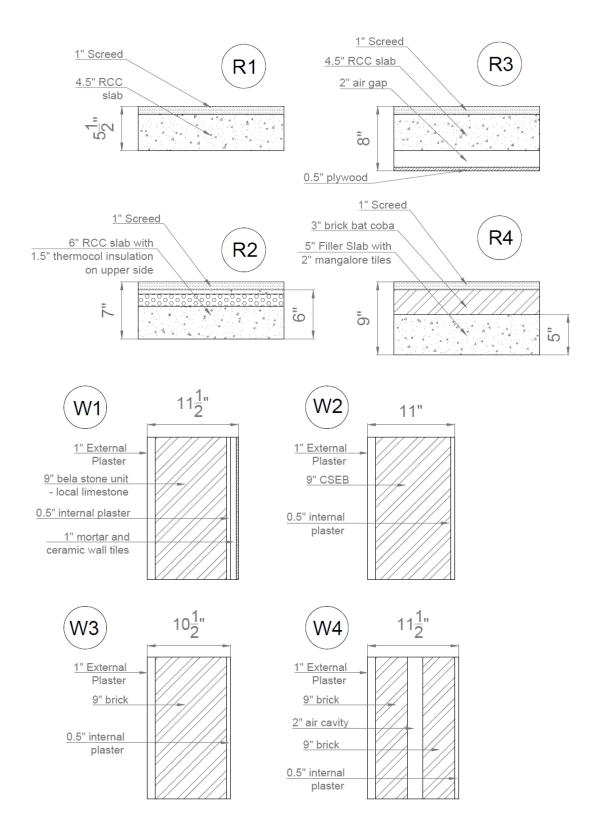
Description of Variables - Walls and roof sections (Source: Author)
